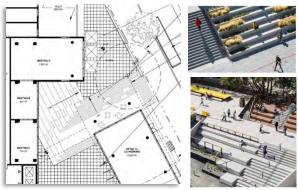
Stairs as Public Space (a) plan view and (b) precedents
